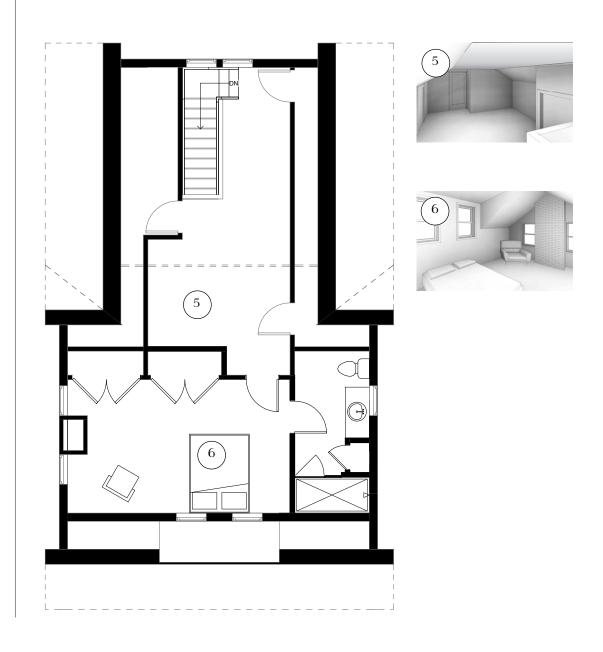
Proposed Second Floor Plan, scale 1/8"=1'
